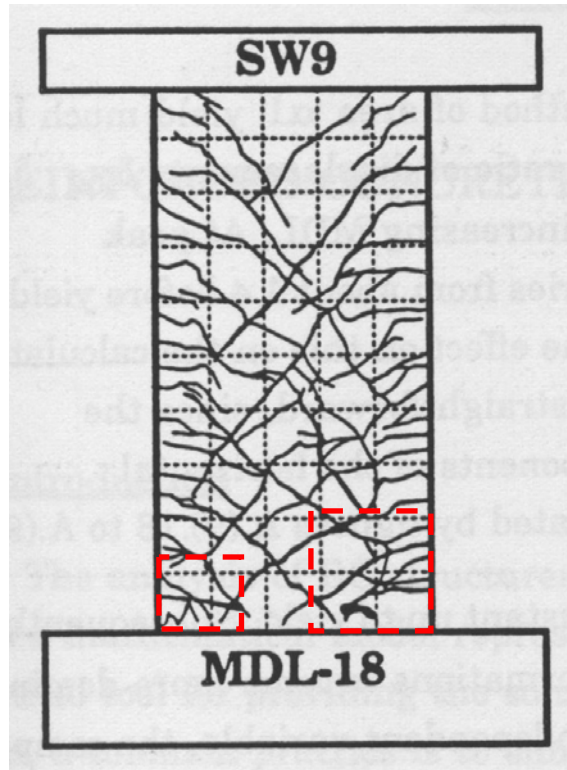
Condition of wall SW9 at 1.50% drift [Pilakoutas (1991)]
